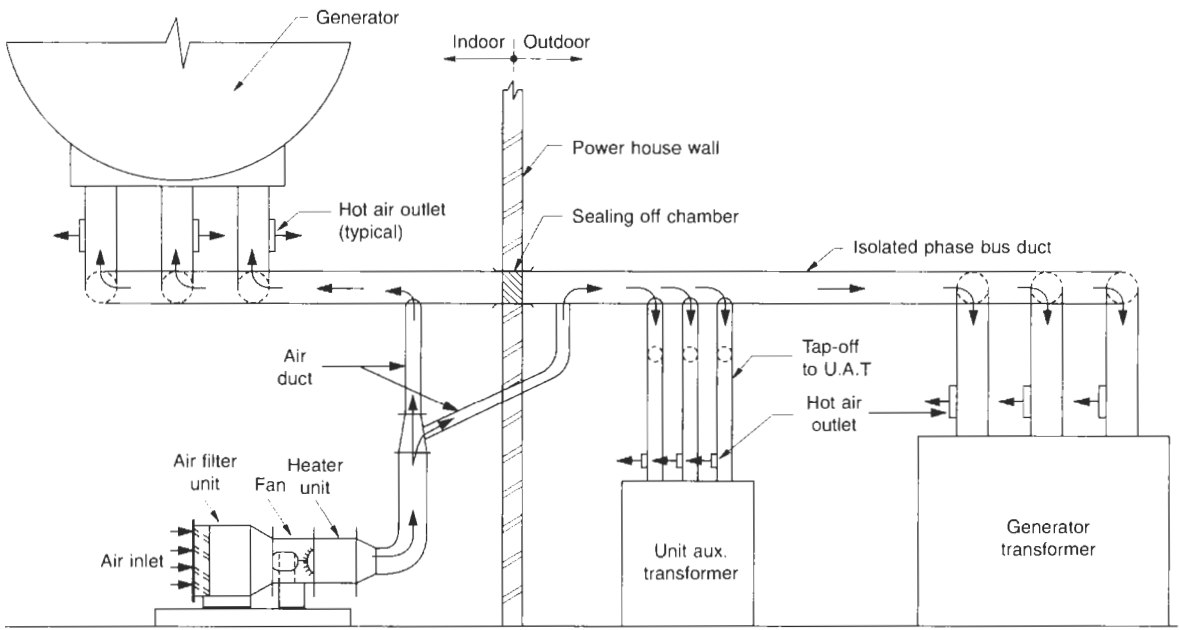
A typical arrangement illustrating drying of enclosure through hot air blowing
